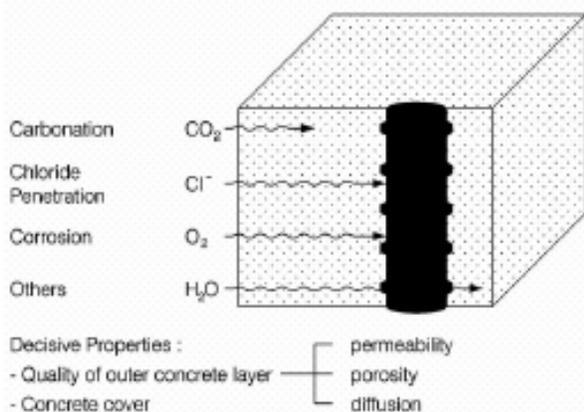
Importance of the penetrability of the outer concrete layer, and the thickness of the cover on the reinforcement to protect the structure against ingress of aggressive substance and deterioration of concrete and reinforcement - see the corner effect on Figure 5.
